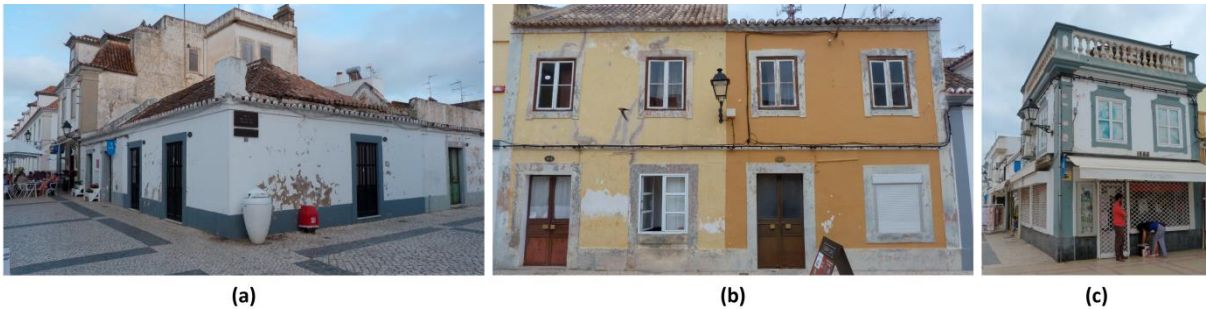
Examples of typical traditional stone masonry buildings in VRSA selected for the seismic vulnerability assessment: (a) original unaltered building; (b) original building with alterations (additional floors); and (c) non-original building constructed in the 19th century
